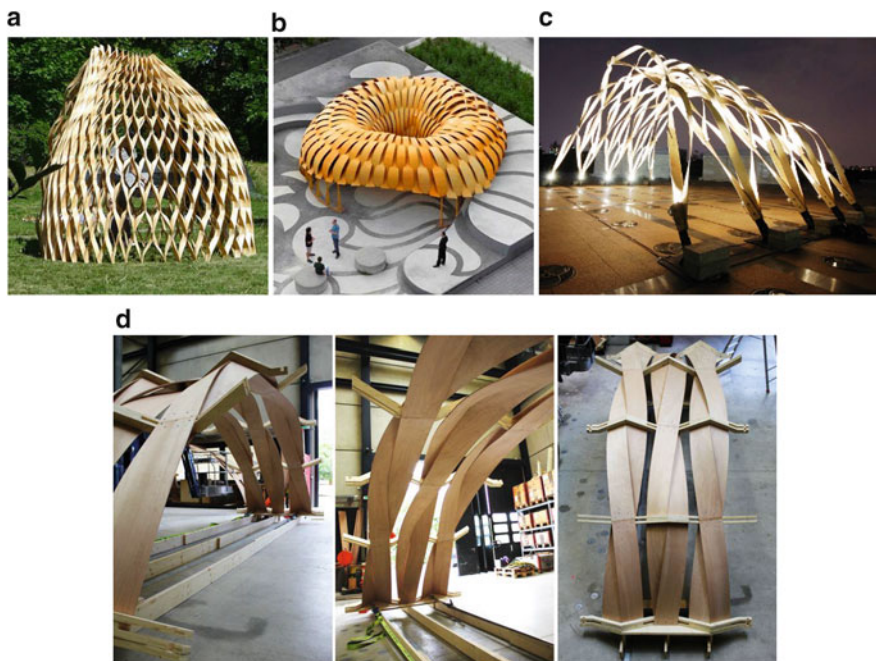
Interlaced form-active structures made from flexible panels: (a) The wood Pavilion of Oslo School of Architecture and Design, (b) ICD/ITKE research pavilion 2010, (c) the “Radical Wood Pavilion” and (d) Timber Fabric Structures (Photo ©Markus Hudert)
